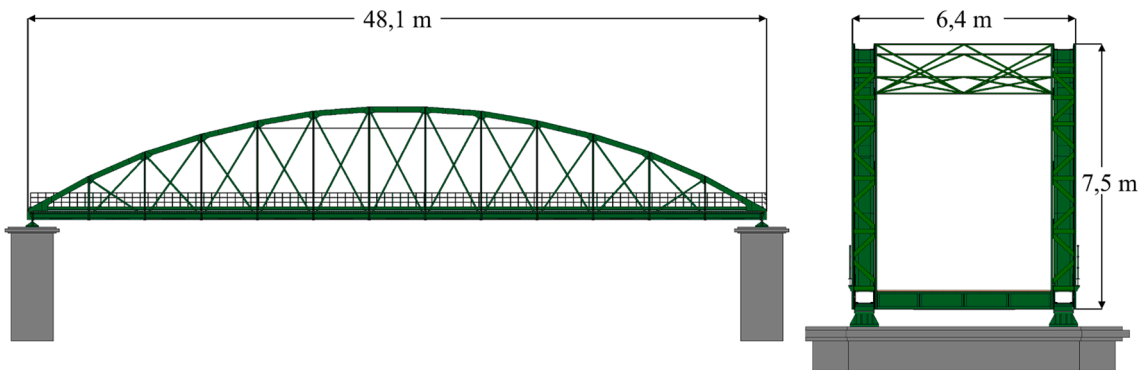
O Barqueiro Bridge: (a) lateral view and (b) cross-section.
